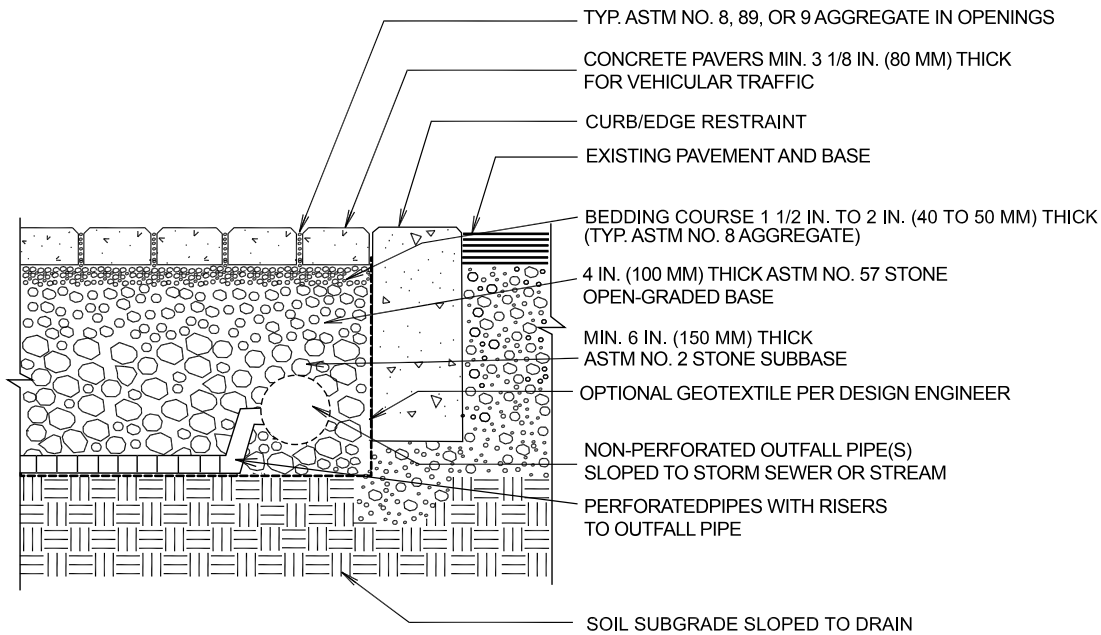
Typical cast-in-place concrete curb divides PICP from an adjacent impervious pavement.
